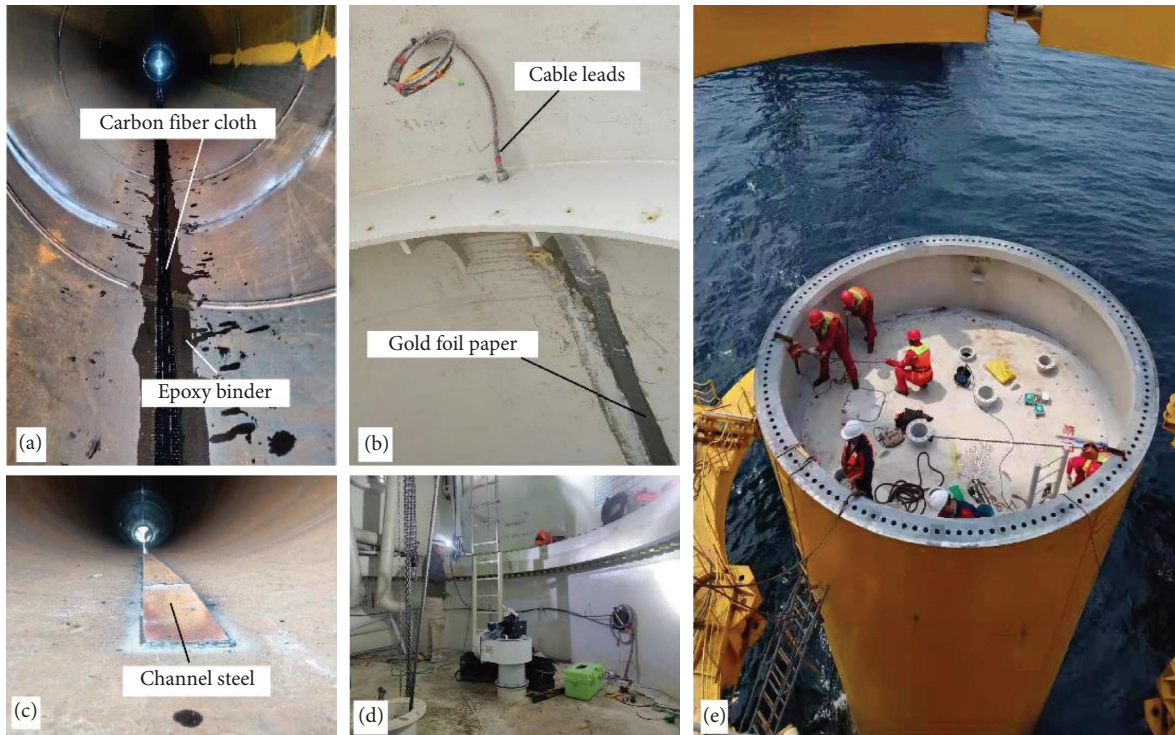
Installation of FO cables for offshore steel pipe piles: (a) the adhesive of the optical cable; (b) protection of cable leads; (c) channel steel welding protection at pile bottom; (d) cable integration; (e) monitoring station.
